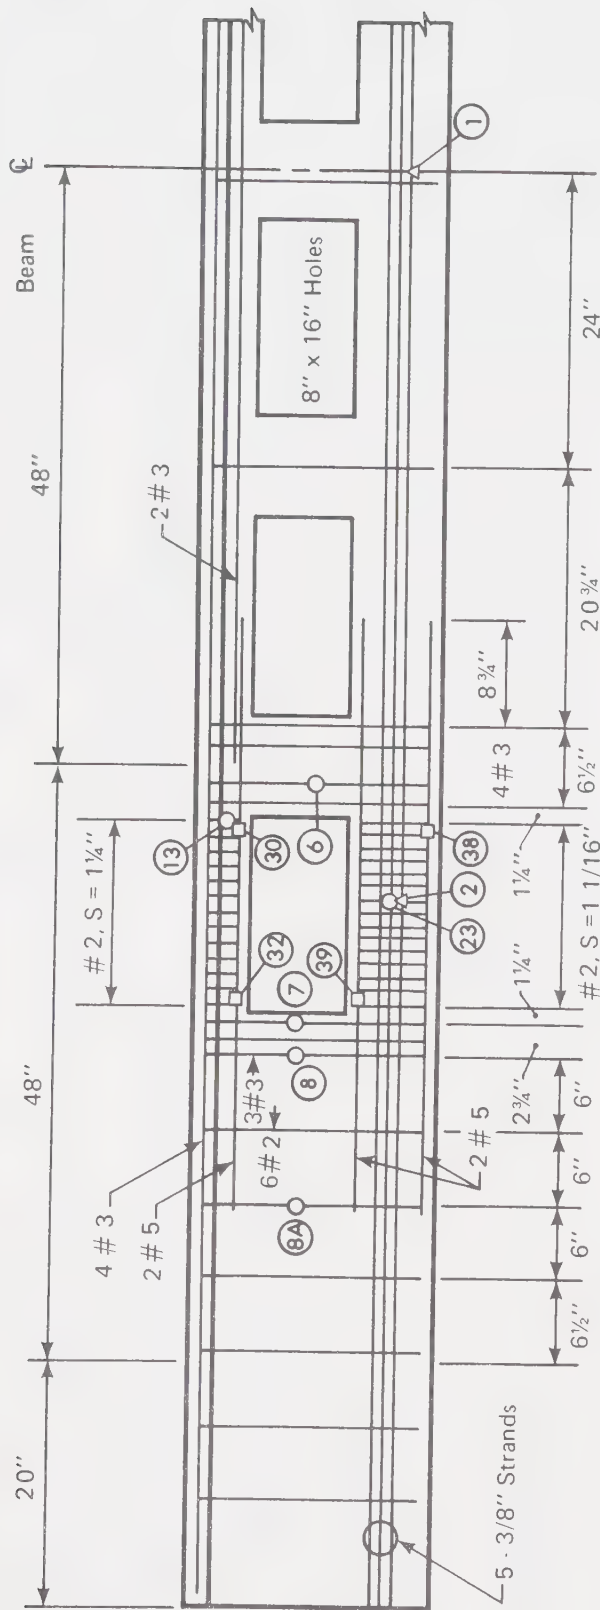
Reinforcement Details and Strain Gage Locations for Beam 27-16-4
